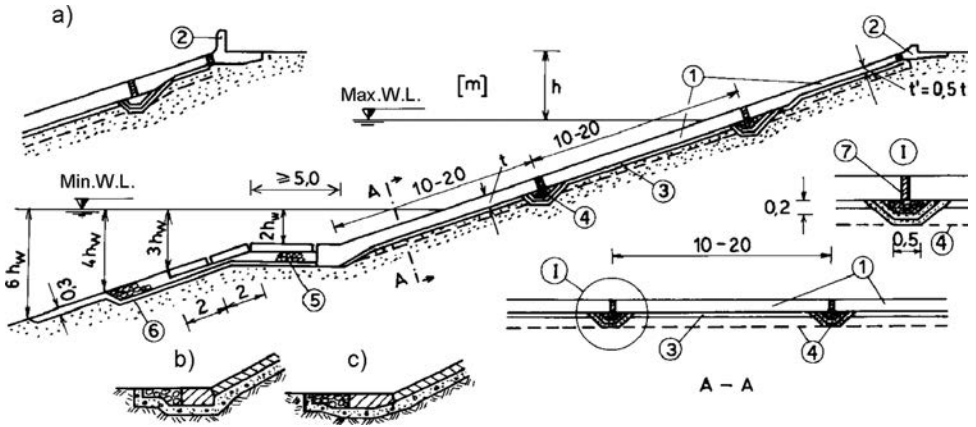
Protection of upstream slope with concrete slabs. (a) Alternative for crest shaping; (b, c) possible solutions for the joint between the concrete protection and the base. (1) Concrete slabs; (2) parapet; (3) layer of compacted gravel 10 cm thick; (4) strip drainage underneath the joint; (5) stone gritting material; (6) gravel 20 cm; (7) bituminized boards,  $\delta = 2.5$  cm.
